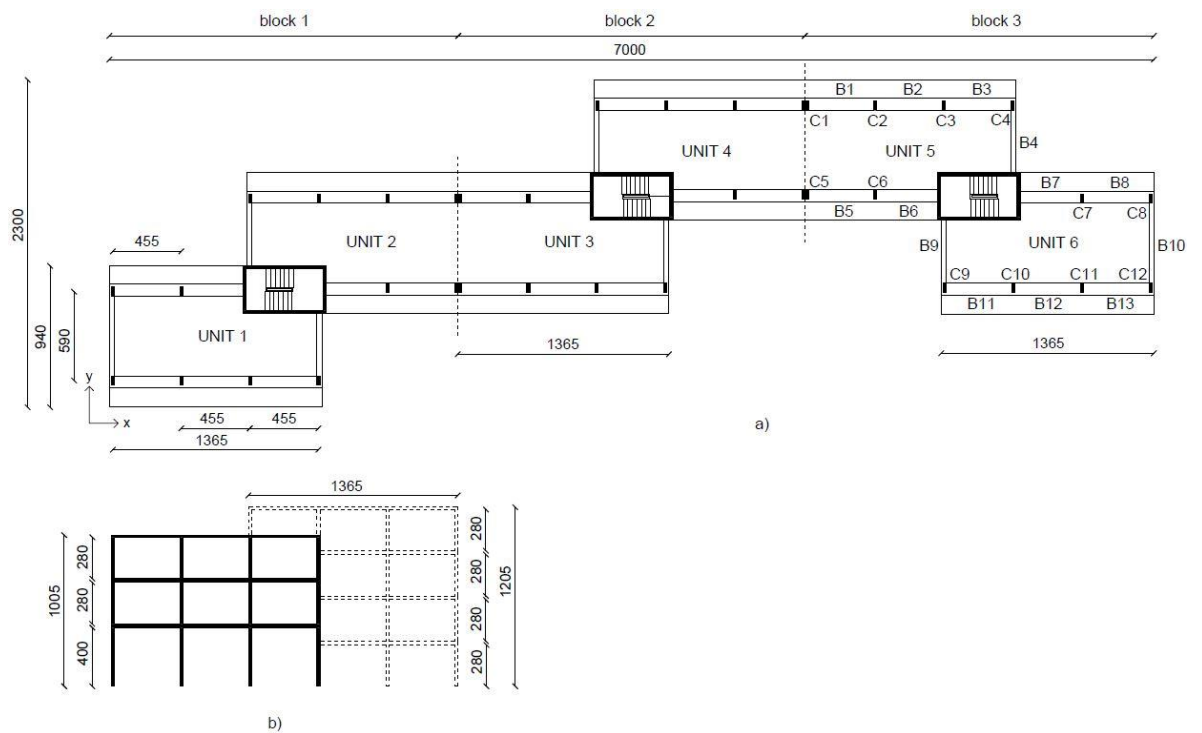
Building A: (a) plan of the first floor and (b) elevation of block 1.
